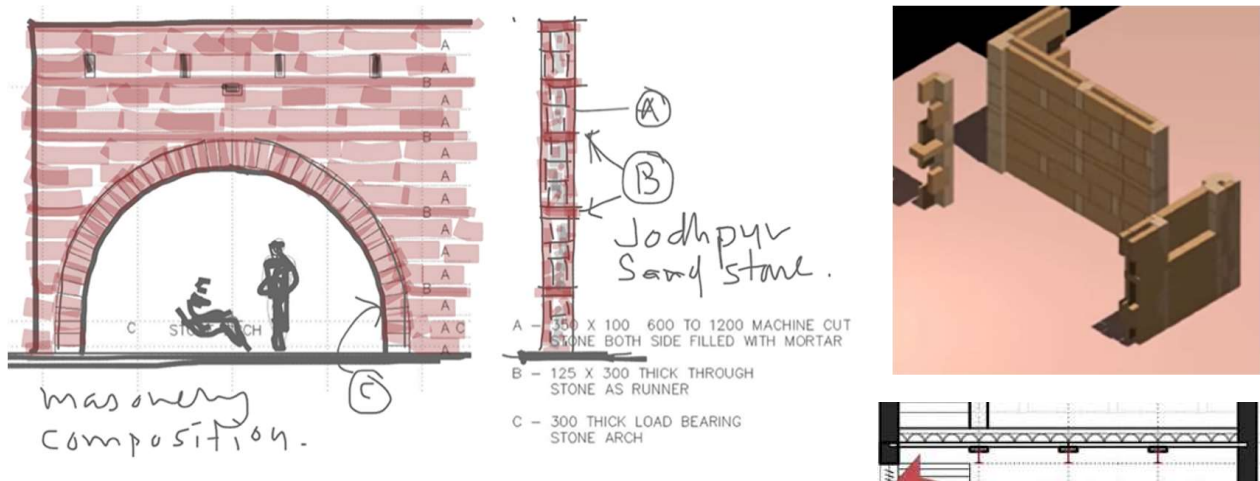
Load bearing wall with stone and wall & roof details (Source: taoarchitecture.com)
